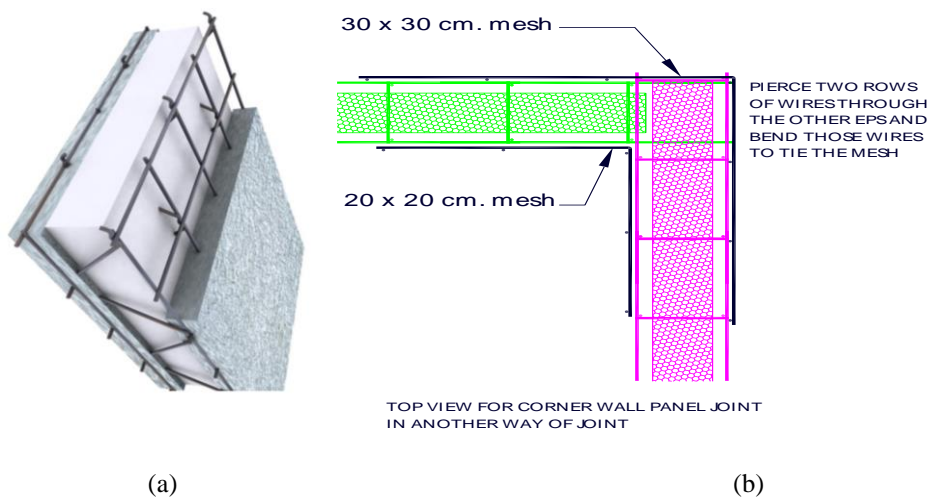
(a) 3D Section of the sandwich panel; and (b) Sample of connection details between panels
